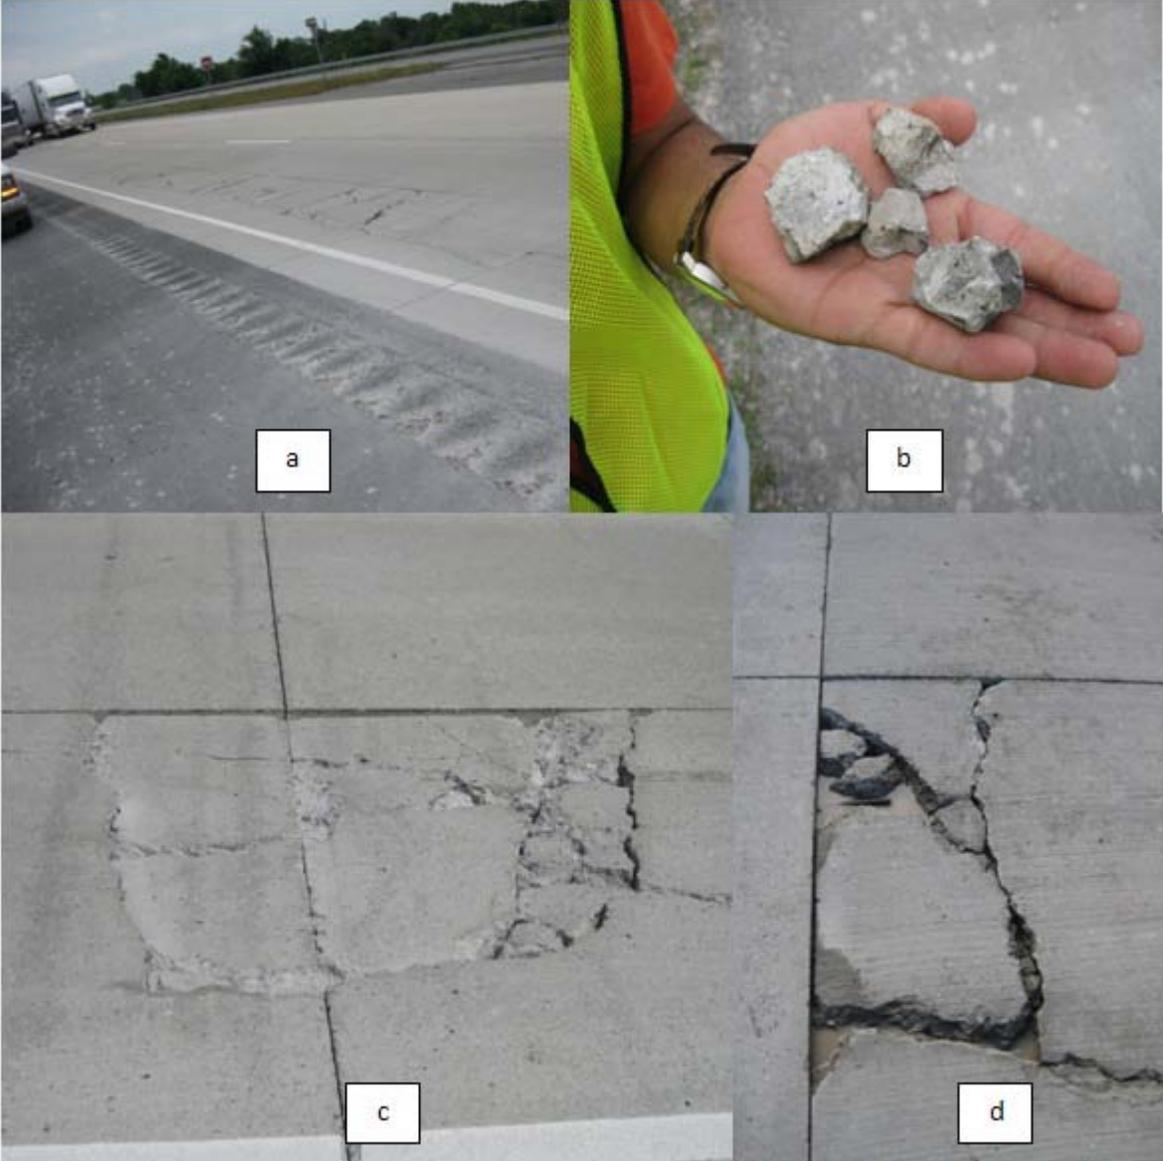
Photos showing the failures of panels in the right wheel path of driving lane of the overlay. Photo a shows failures observed in continuous panels. Photo b shows the pieces of concrete that came from the failed panels. Photo c shows individual panel failures, typically seen in at the intersections. Photo d shows drainage problems in the pavement.
